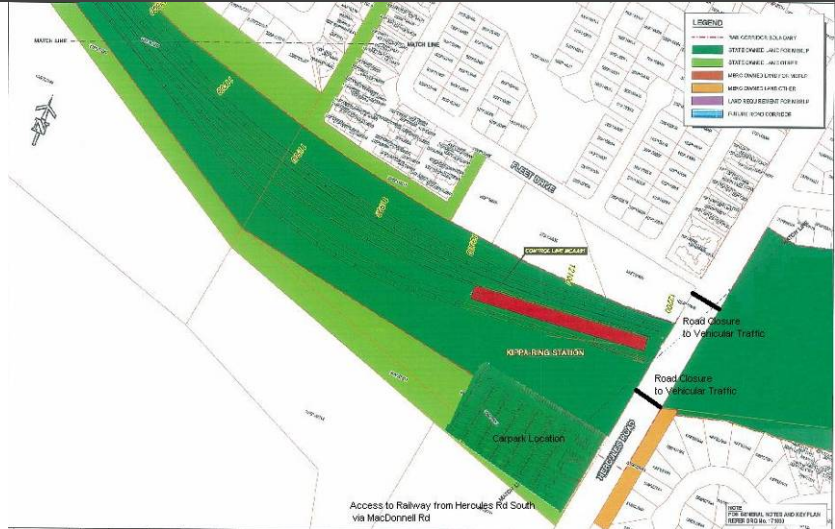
Proposed alternative location of Kippa Ring Train Station with access via Hercules Road South from MacDonnell Rd only
